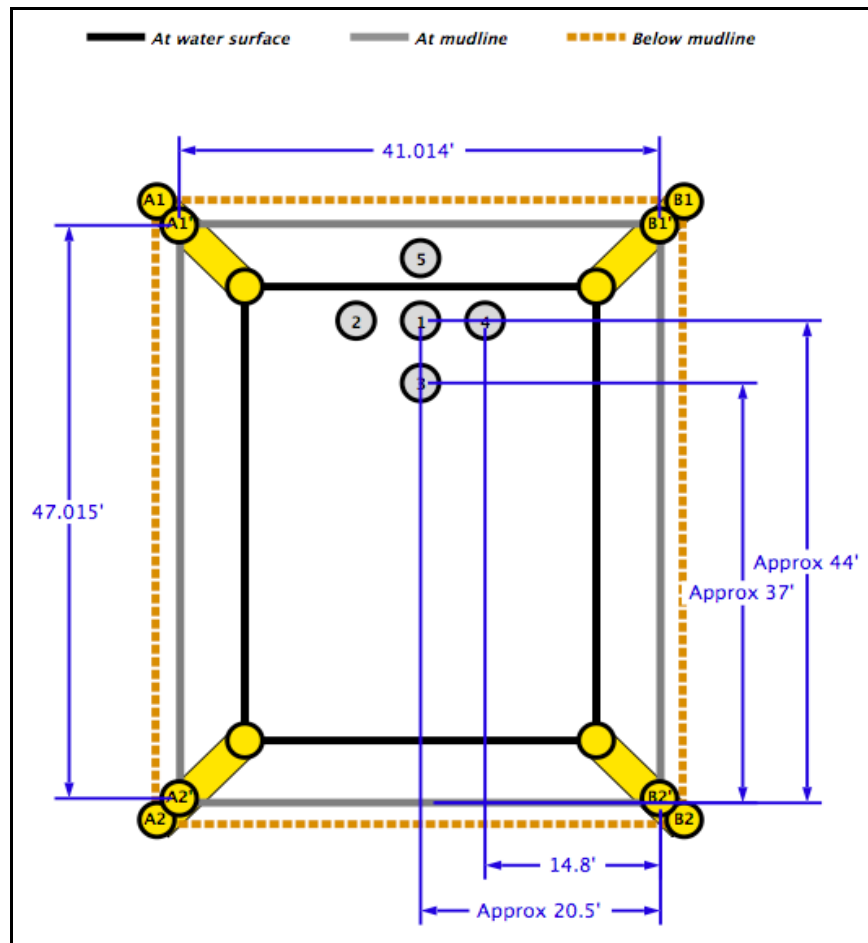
Locations of Various Pilings and Conductors on the EC-32A Structure
